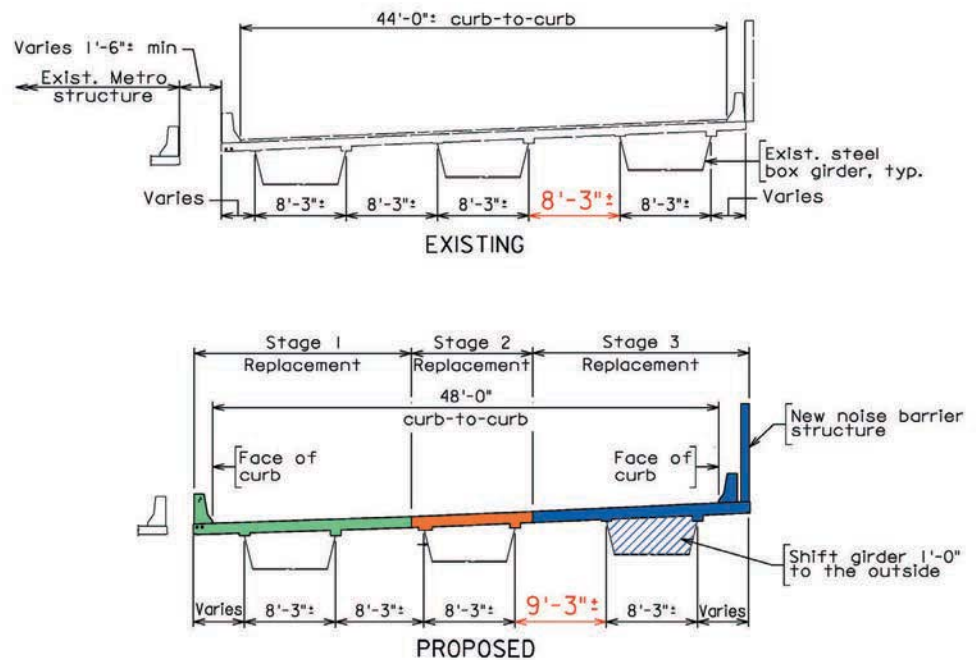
B679 Existing and Final Typical Section
